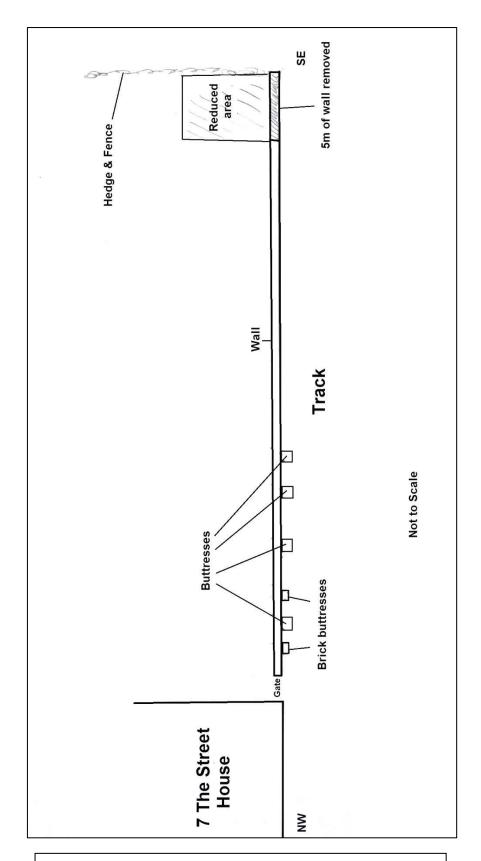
7 The Street, Kingston: Sketch plan of site showing the wall and area monitored
